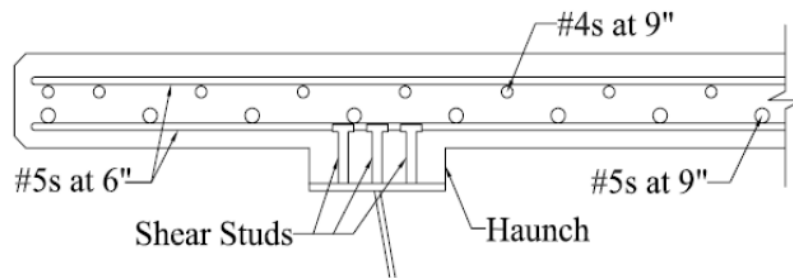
Rebar profile in cast-in-place concrete deck [Hovell, 2007]
